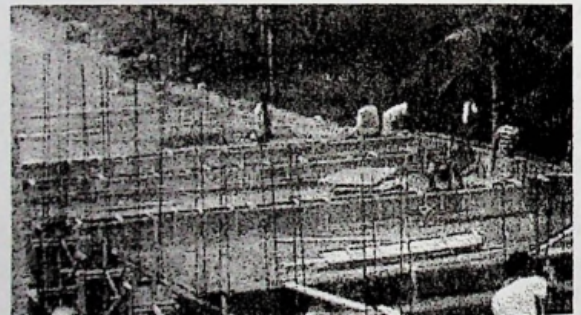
Construction of Connecting Beam at Retaining Wall - Type 3
